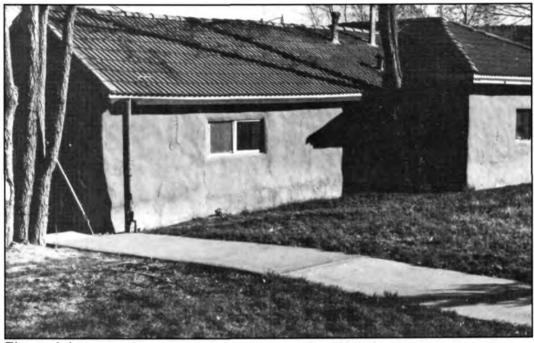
Building 13 showing the west elevation of Guest Unit 10.
